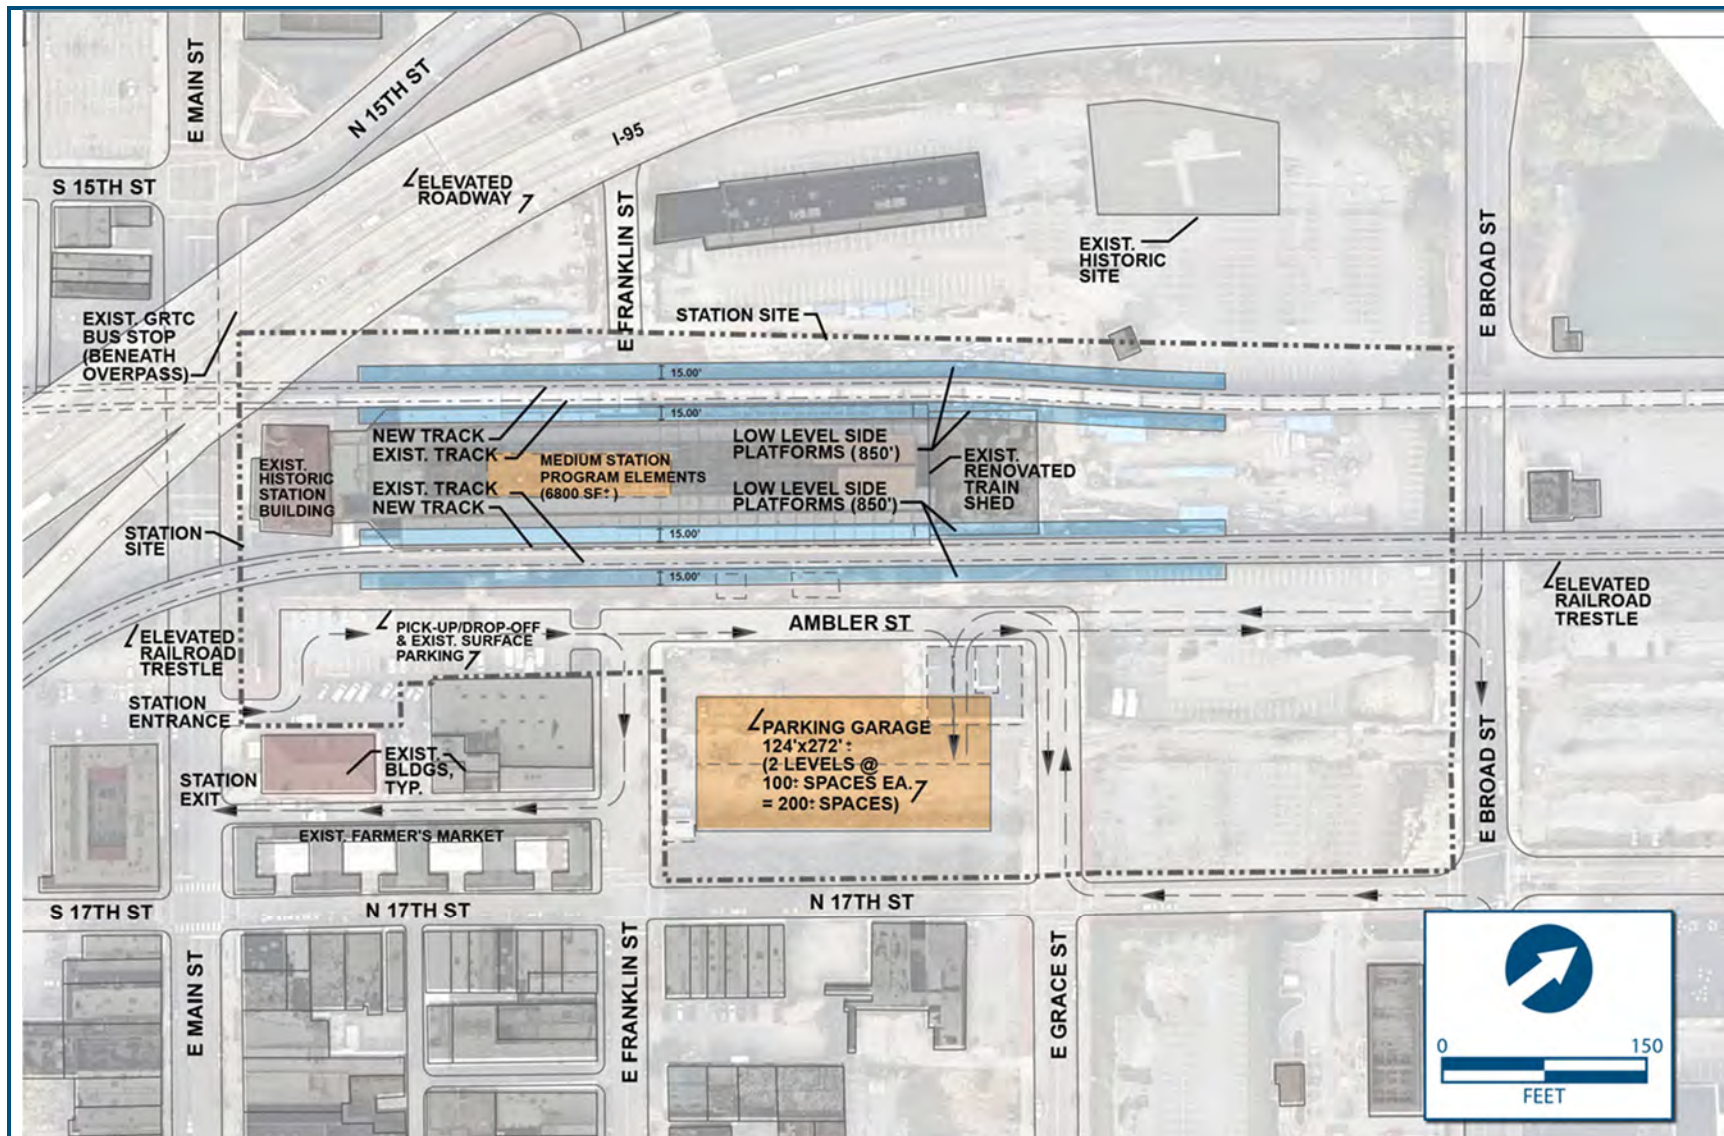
Main Street Station Improvements for Build Alternative 6G
